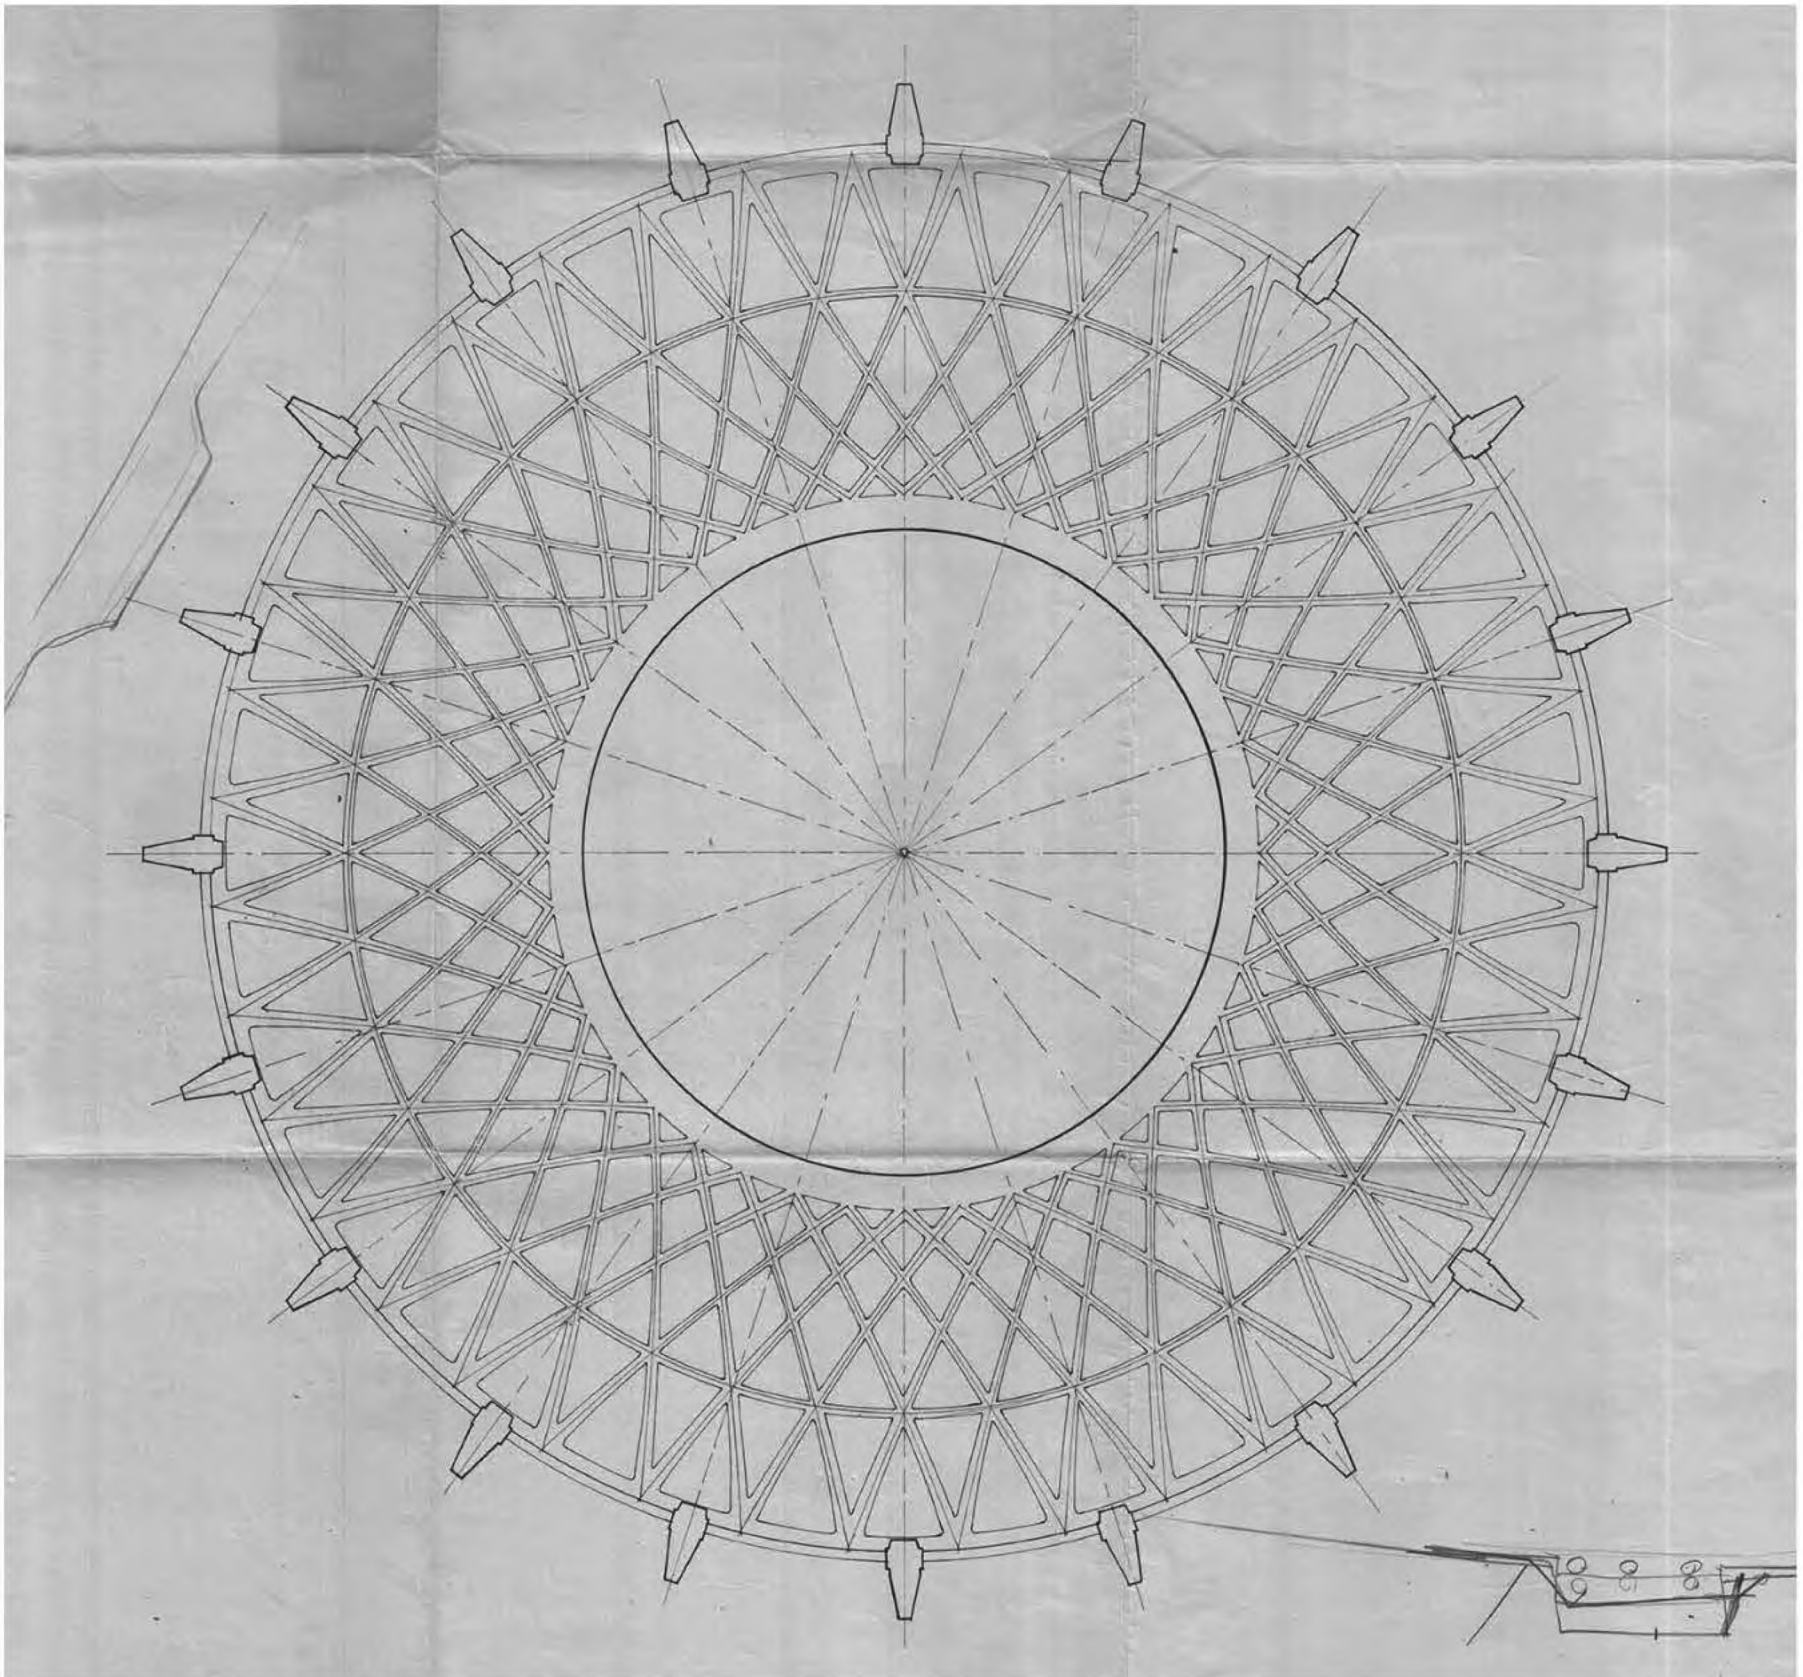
ST1 - Special Ribbed Floor Plan (detail), Studio Nervi, Rome, 1964. (John Stigter Archive.)
